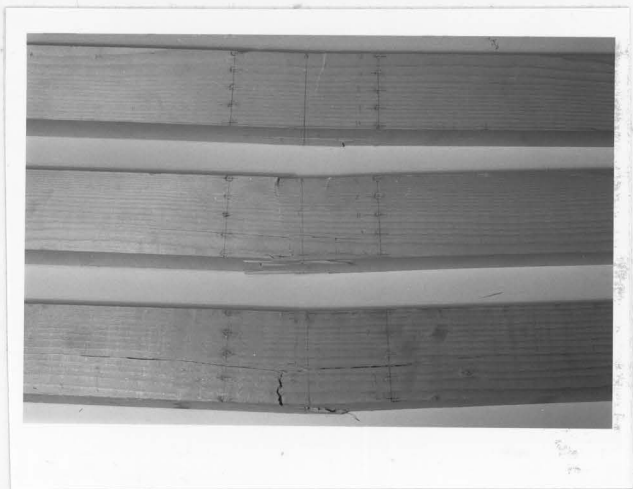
TYPICAL FAILURE IN 2 x 4 CLEAR BEAM SUBJECTED TO CENTRAL LOADING
